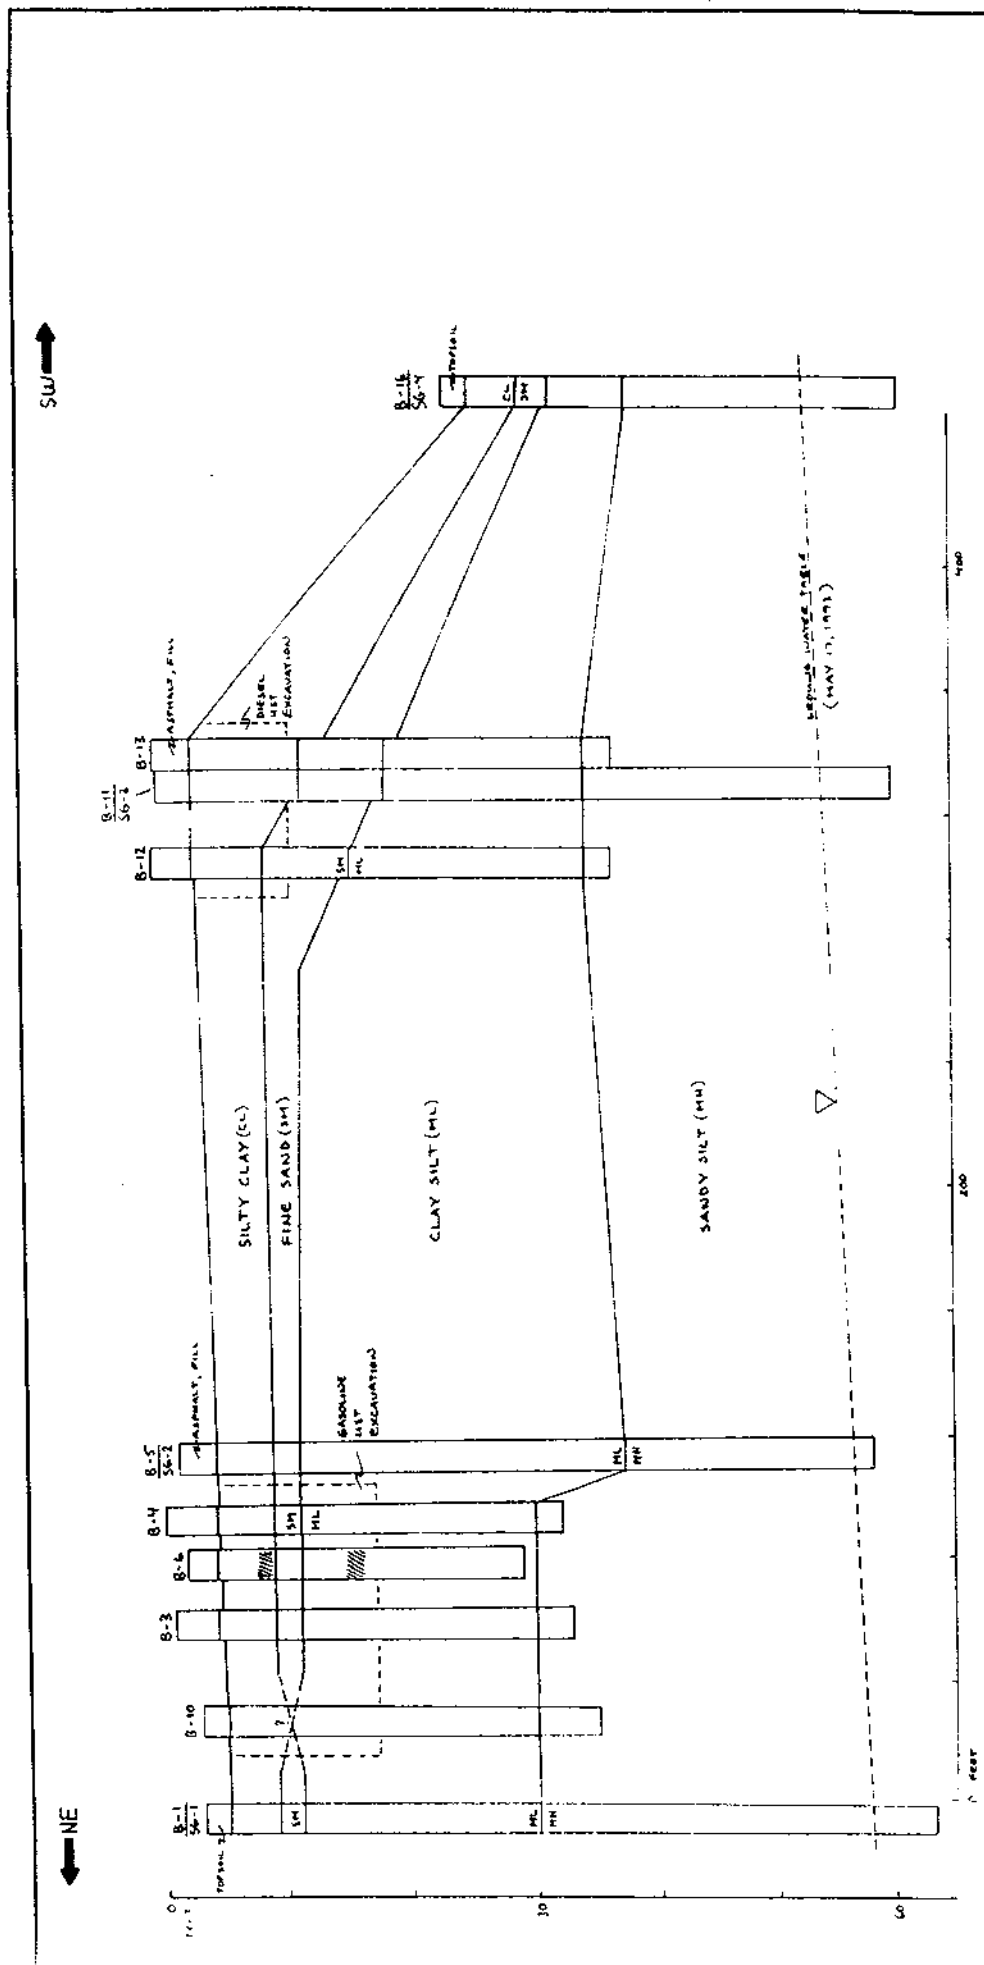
CROSS-SECTION OF SITE, A/E TO SW.
